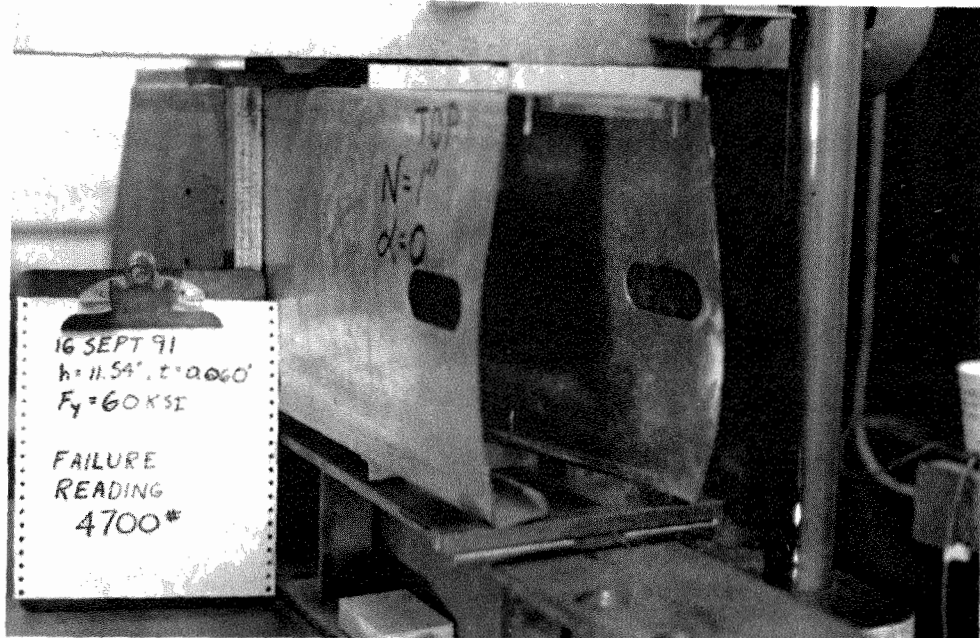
Typical Unreinforced EOF Web Crippling Failure, EOF-SU-1-2-1
